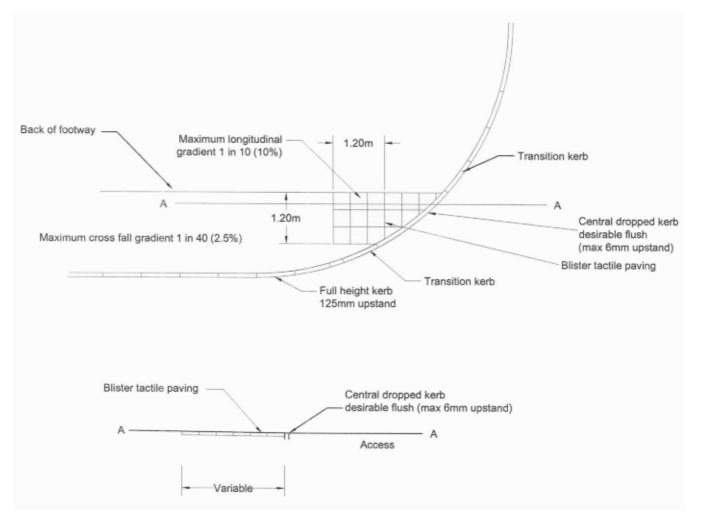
Kerb and tactile paving detail in respect of standard access to 2 to 5 dwellings (to be used on Class 3 highway).
